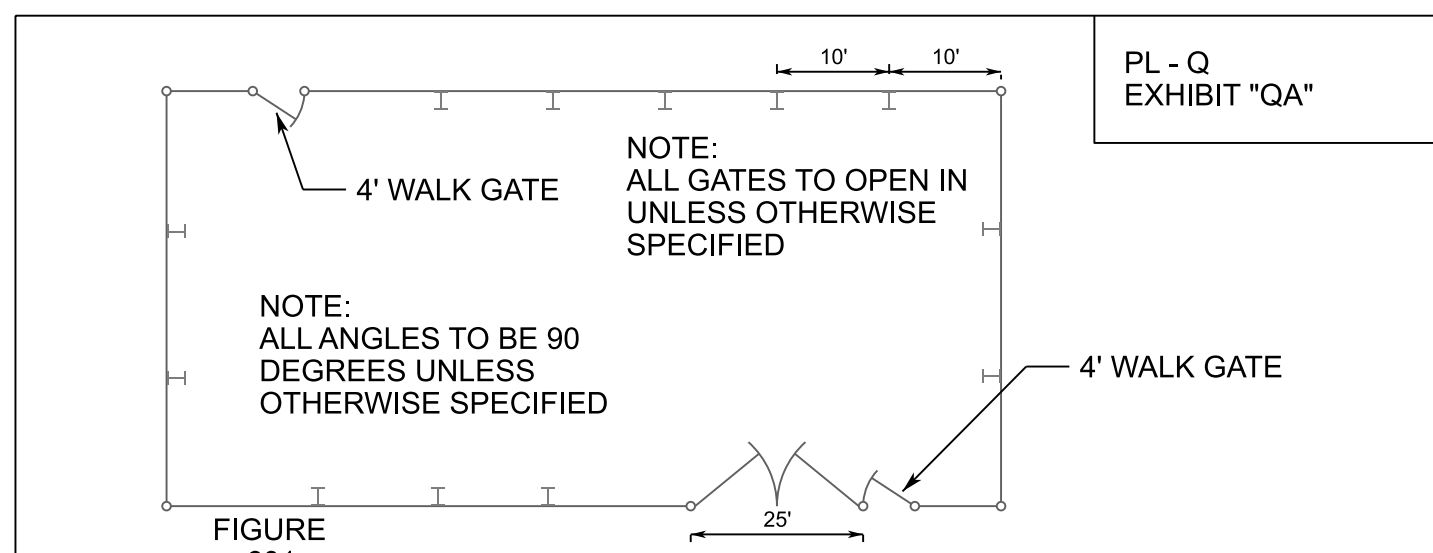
TYPICAL FENCE LAYOUT PLAN
